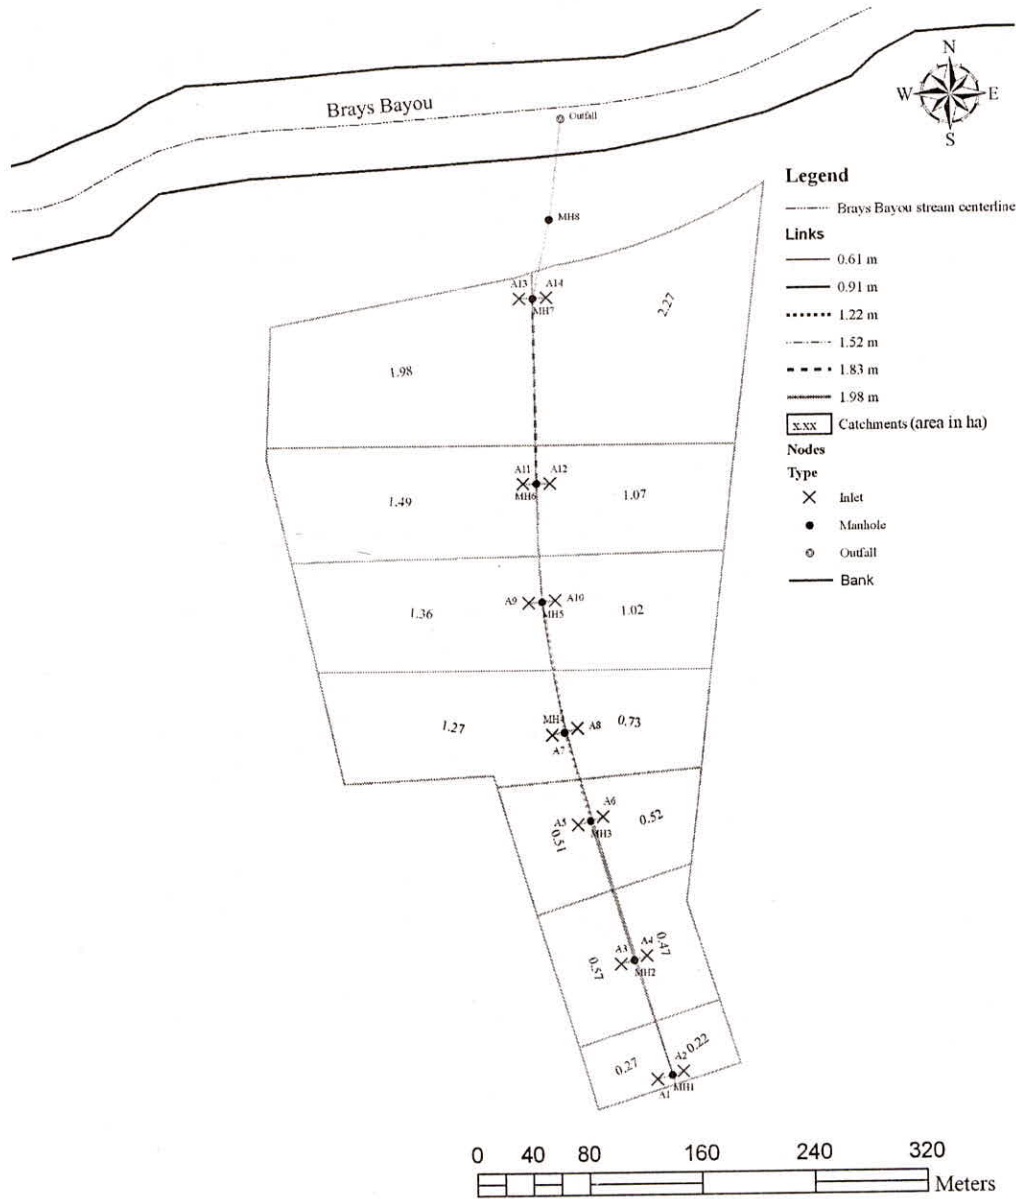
Plan of a proposed roadway close to Brays Bayou, City of Houston
